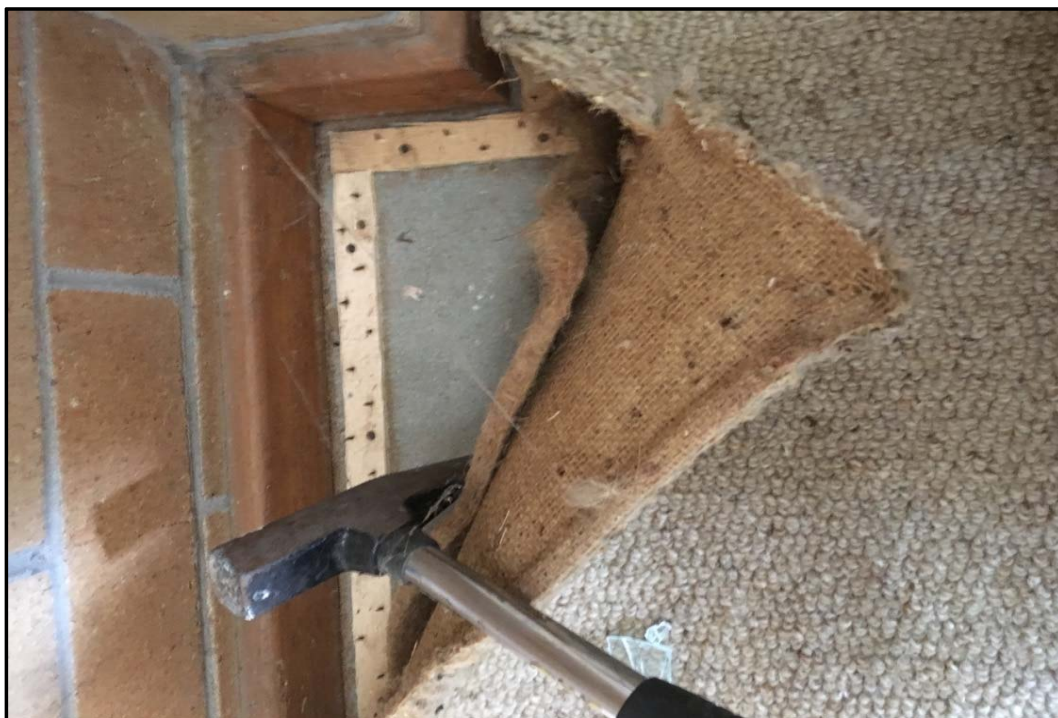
Building 3 - Carpet Underlay under (entire floor area ~700m2).
